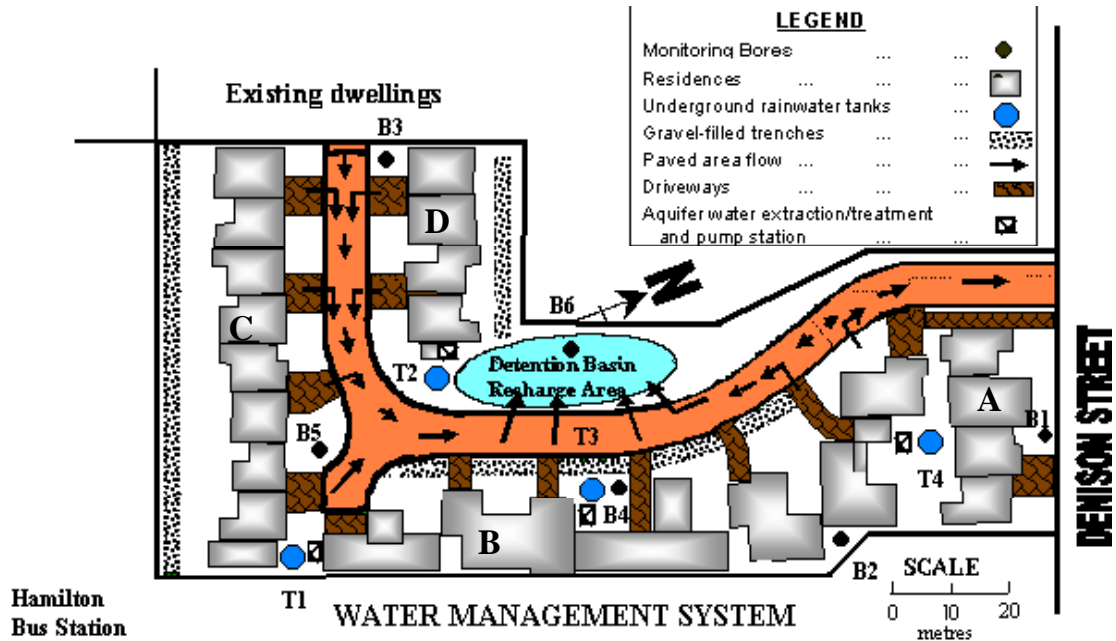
General plan and water sensitive design elements of Figtree Place
